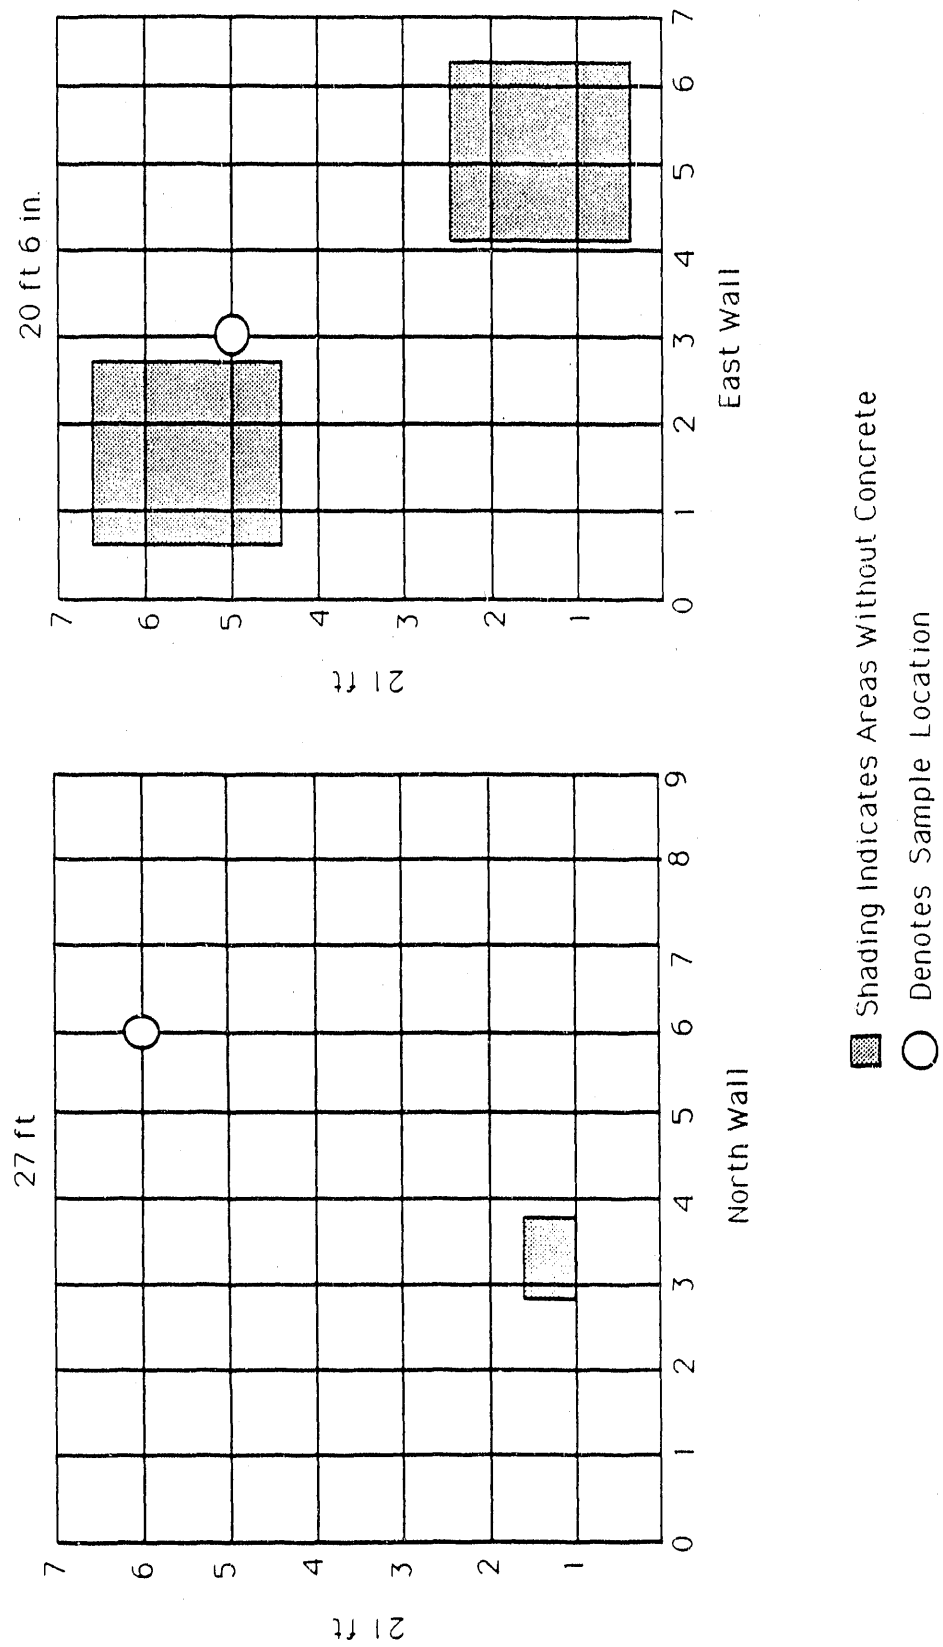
Area 1 Exhaust Fan Room Verification Concrete Core Samples. (sheet 1 of 3)
